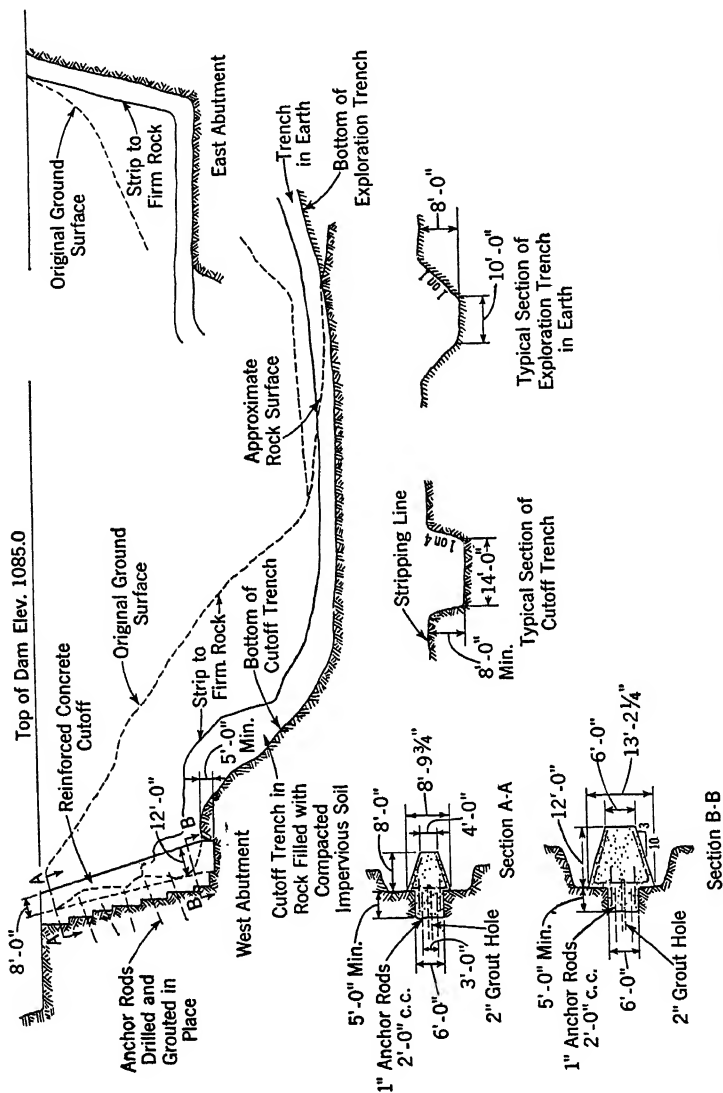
Cutoff wall and cutoff trench, Pleasant Hill Dam, Ohio (1937).
